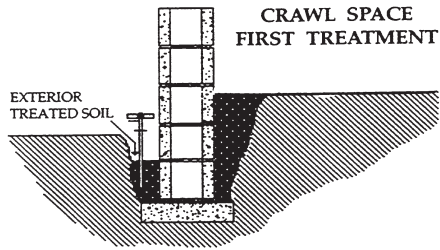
Preconstruction treatment of inside and outside foundation perimeter.
